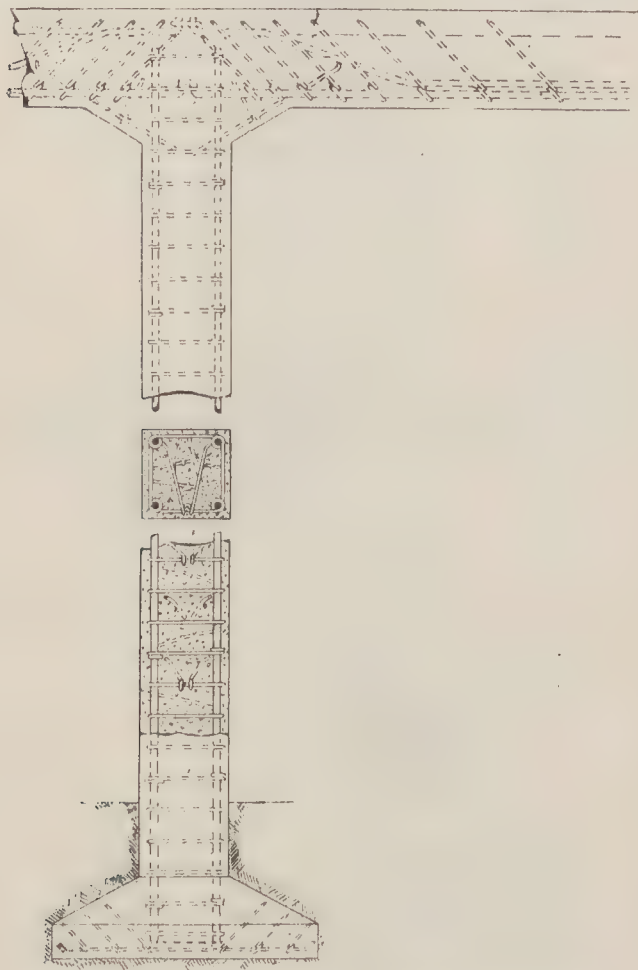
British Reinforced Concrete Engineering Company's System.
